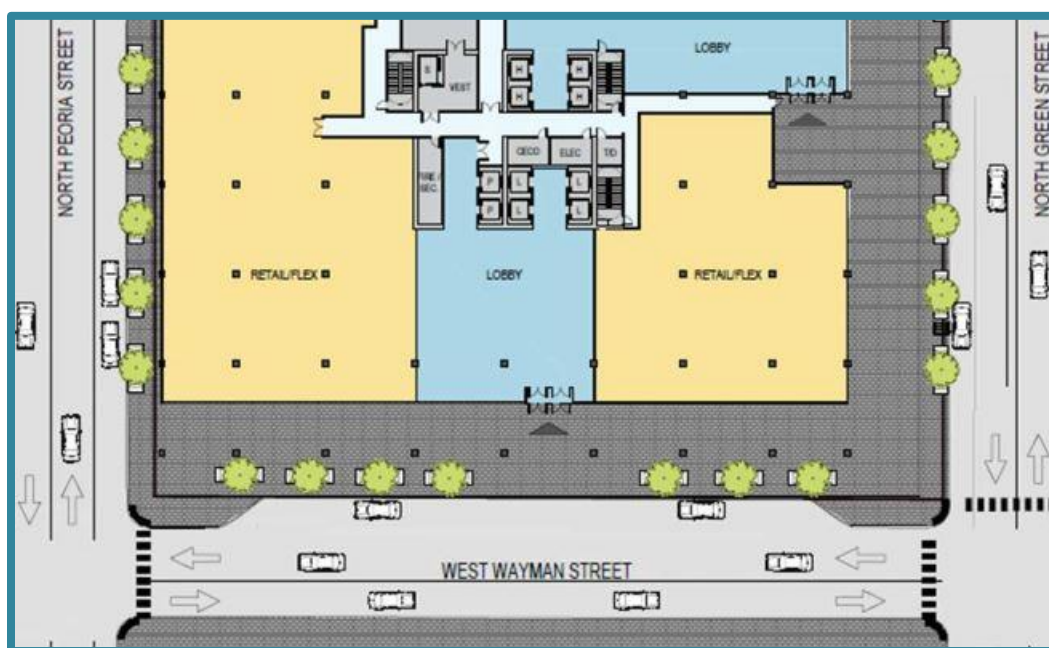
Site Plan Showing Off-street Pull-out (from Sterling Bay Co.)
